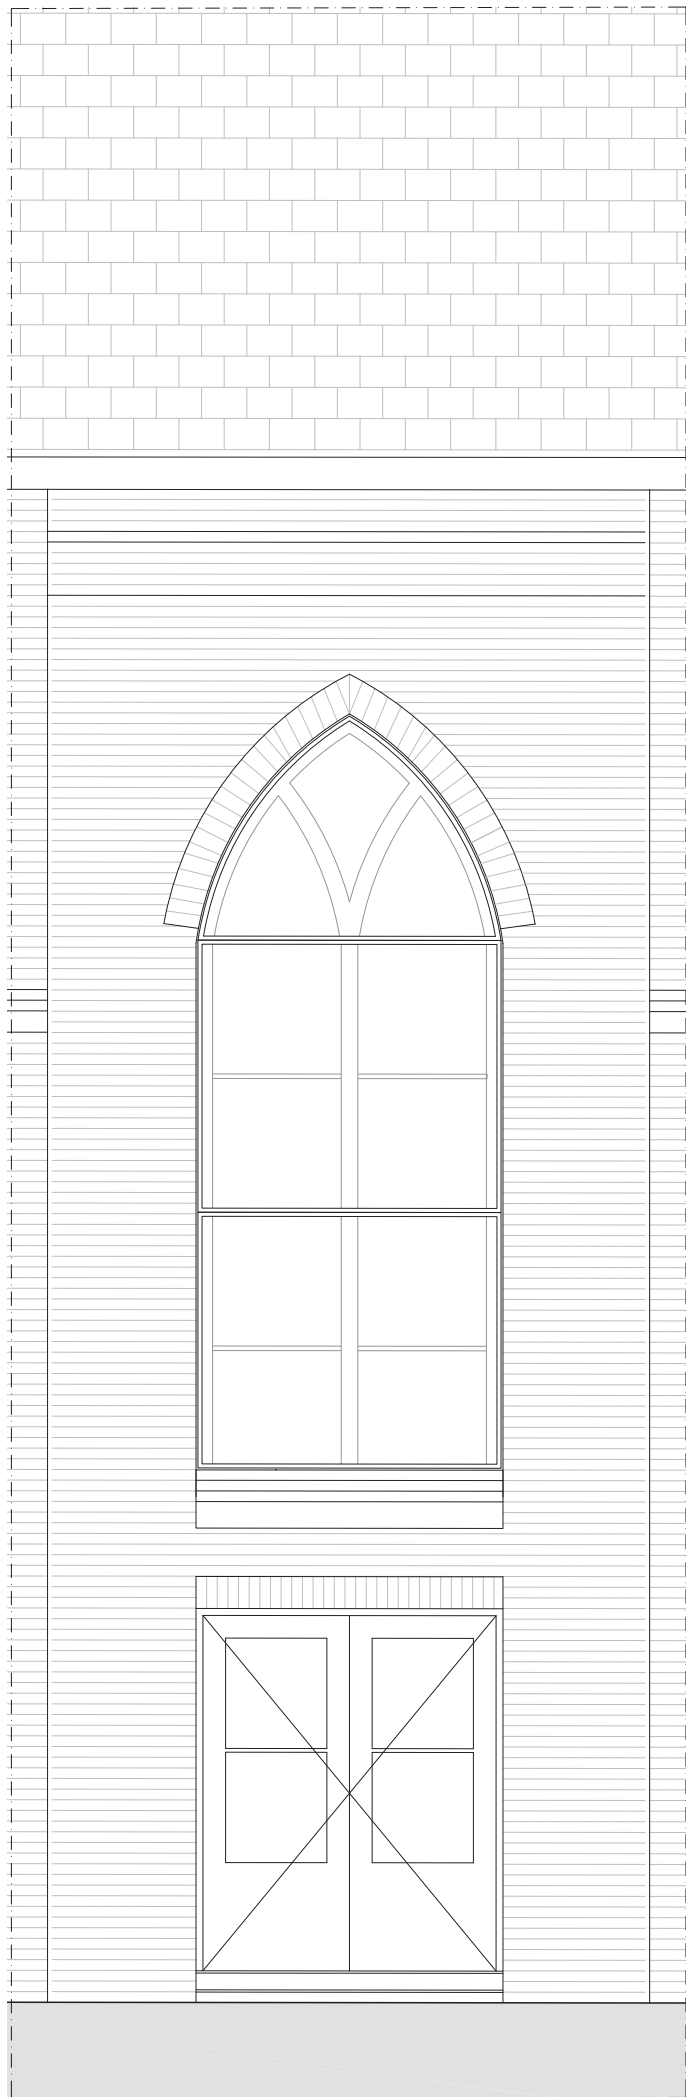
WINDOW WITH LAMELLA - 1:5
